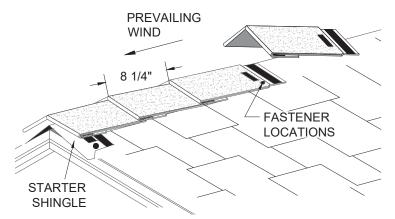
Placement and Fastening of EZ-Ridge® Shingles, Maintaining the 81/4" Exposure
